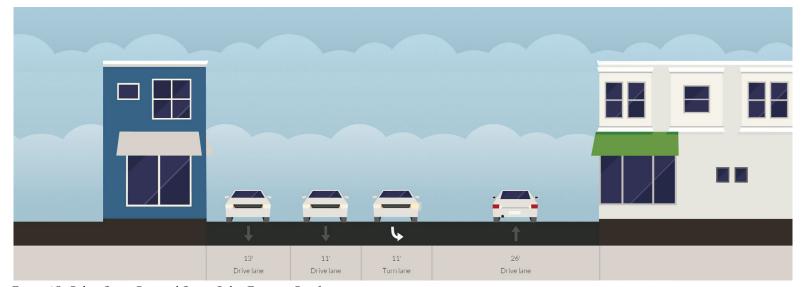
Cabot Street-Rantoul Street Split: Existing Configuration
